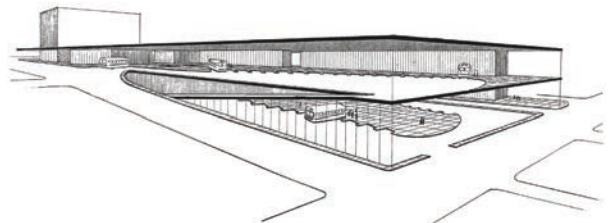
COLIN AND ZEHAVI PLAN FOR A 2 STORY STATION 1960
